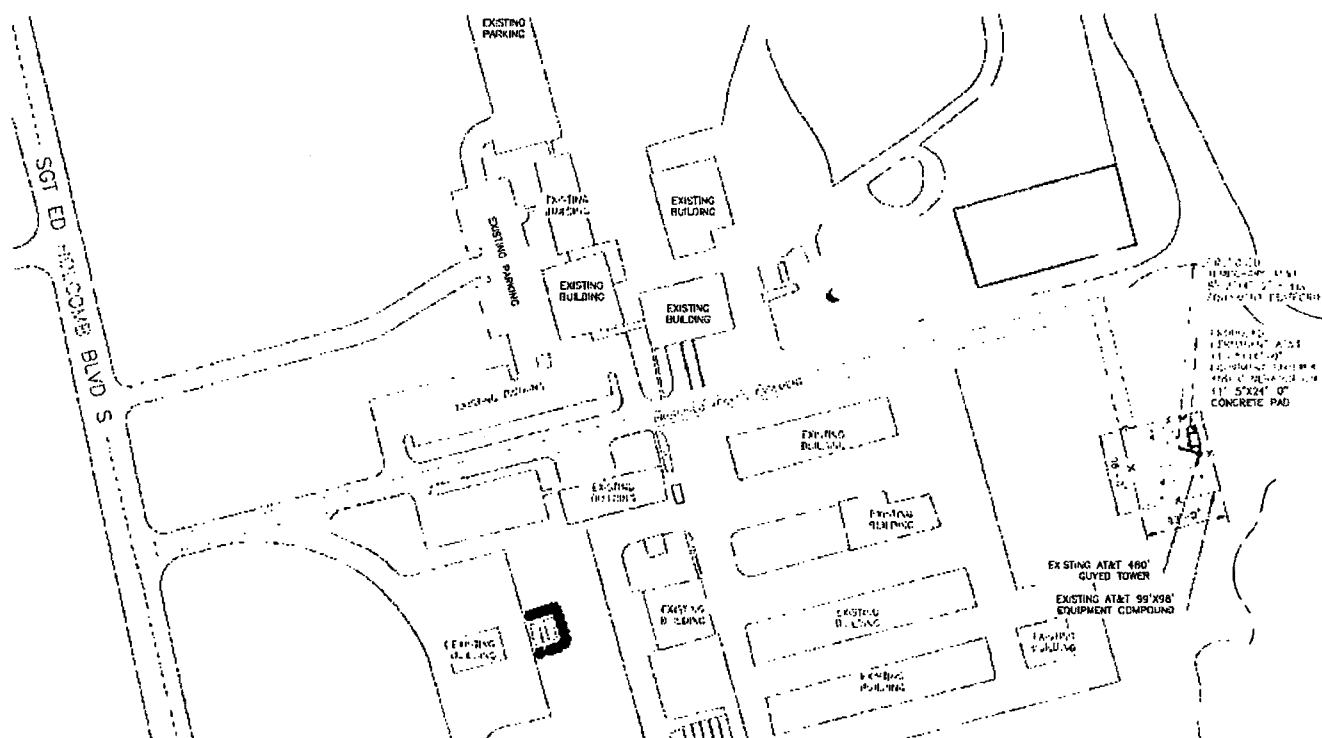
Exhibit B: Site Drawing indicating the location of Ground Space for Licensee's equipment shelter/skid/pad or space in Licensor's building (as applicable)
